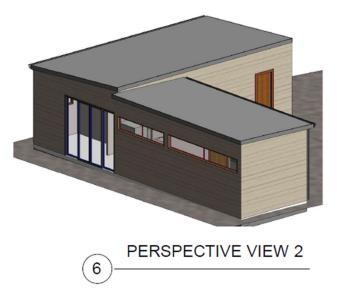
Extract of the architectural plans (3-D Model) showing the subject outbuilding
